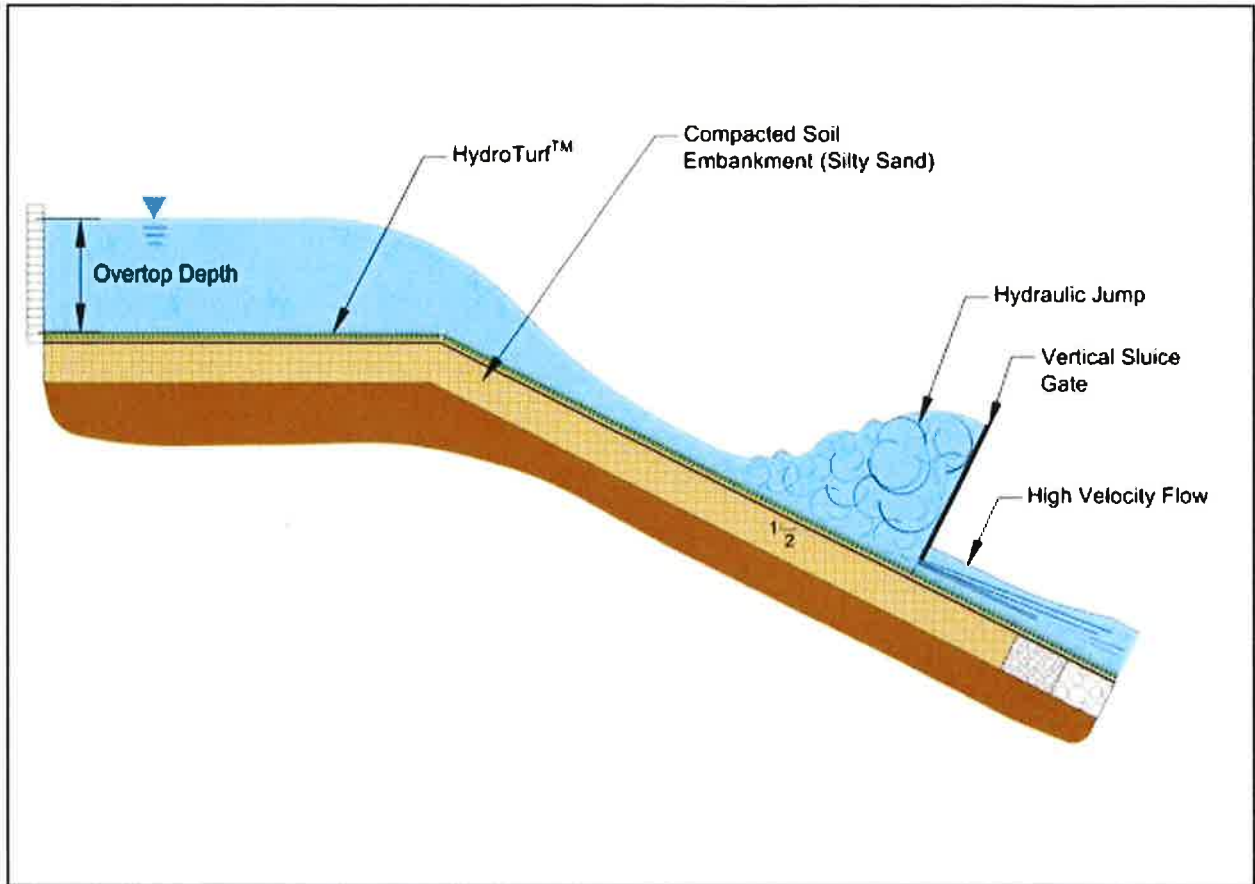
Profile Section of the Installed HydroTurf® System in the Overtopping Flume for Hydraulic Jump Testing
